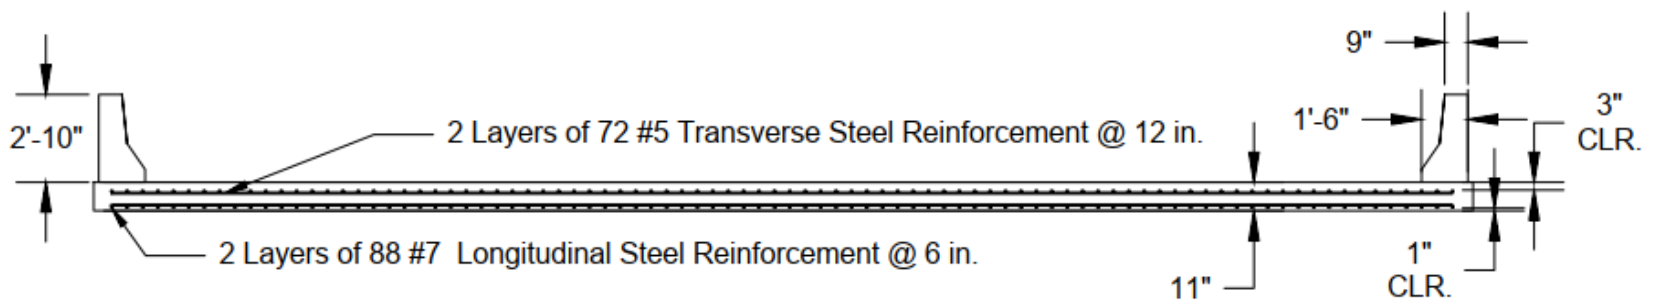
Cross-sectional view of the primary slab-span bridge (Bridge 27926).
